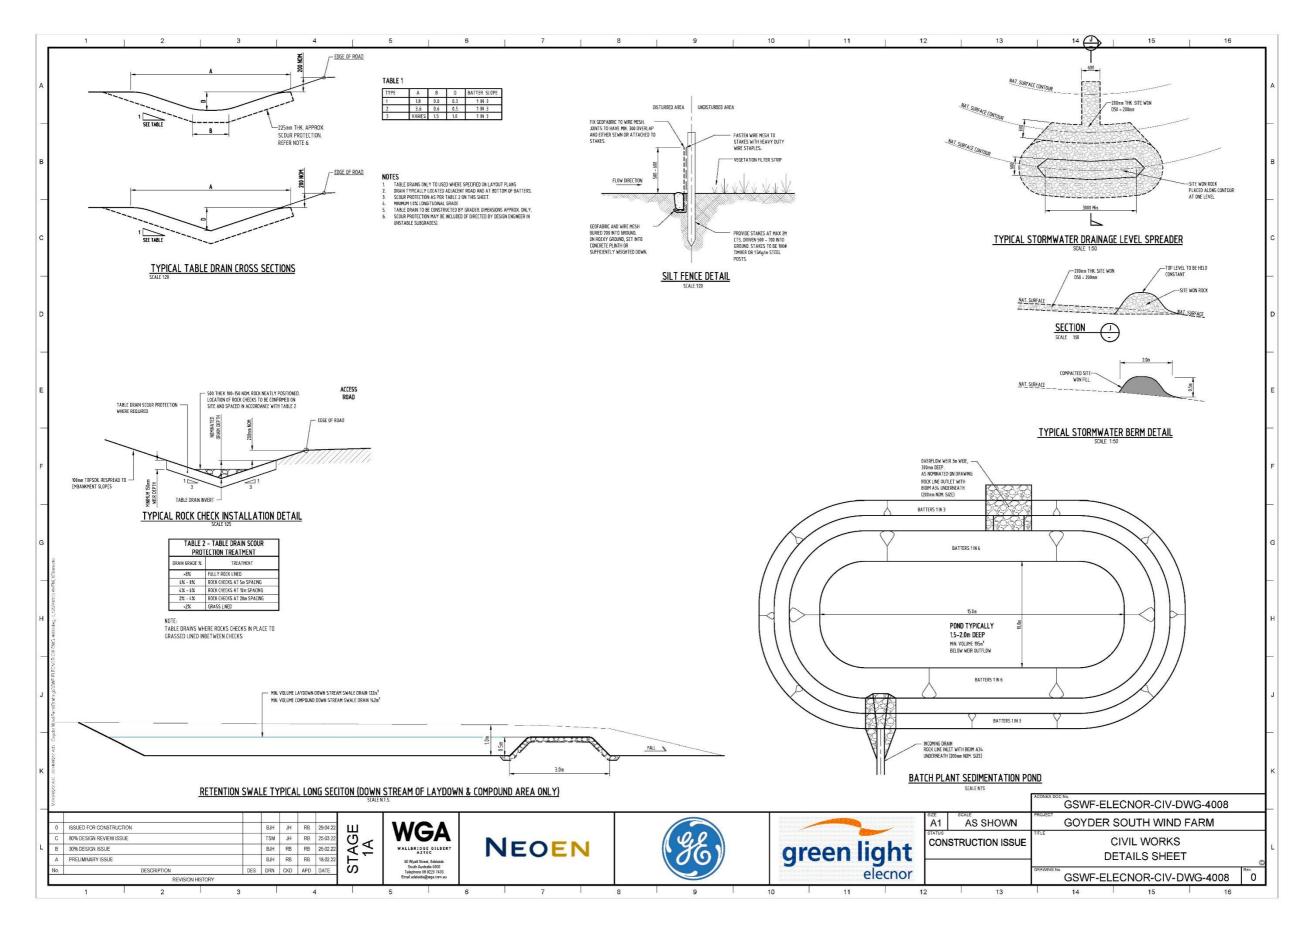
Design details of stormwater management arrangements for the temporary facilities
